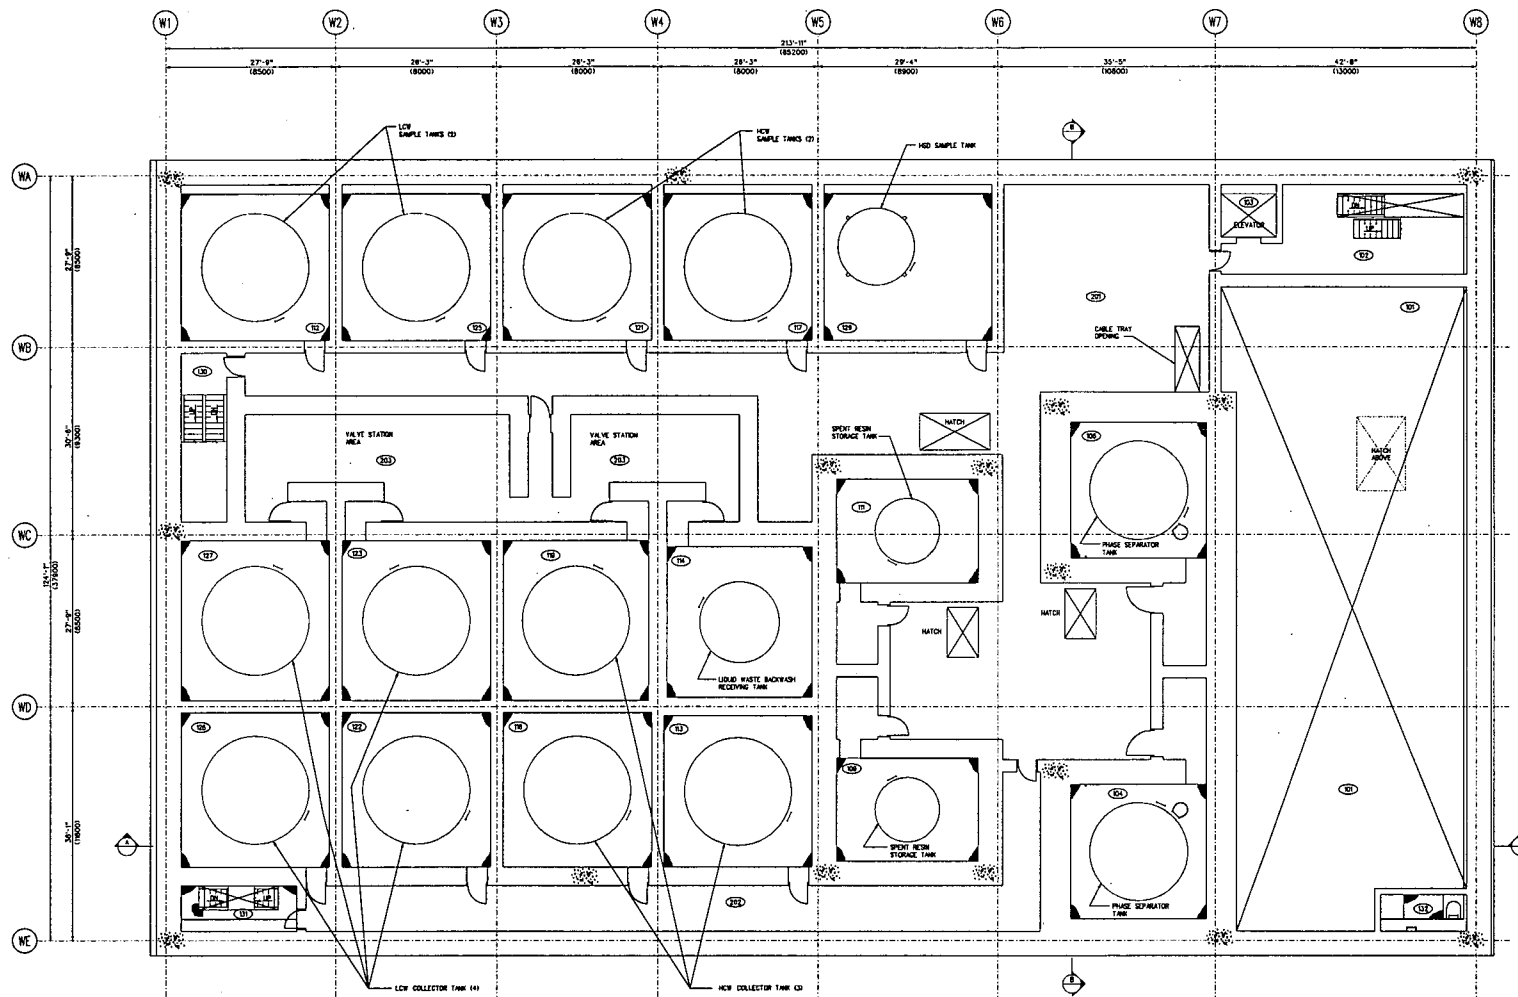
A RADWASTE BUILDING AT ELEVATION -1700 MM
